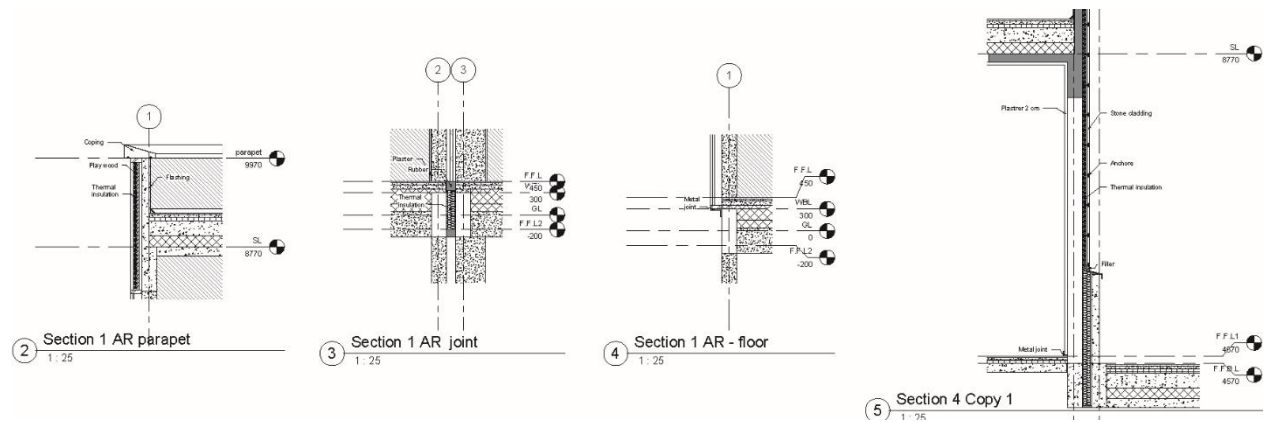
Building Components, UAEU, BIM Detailing Samples
